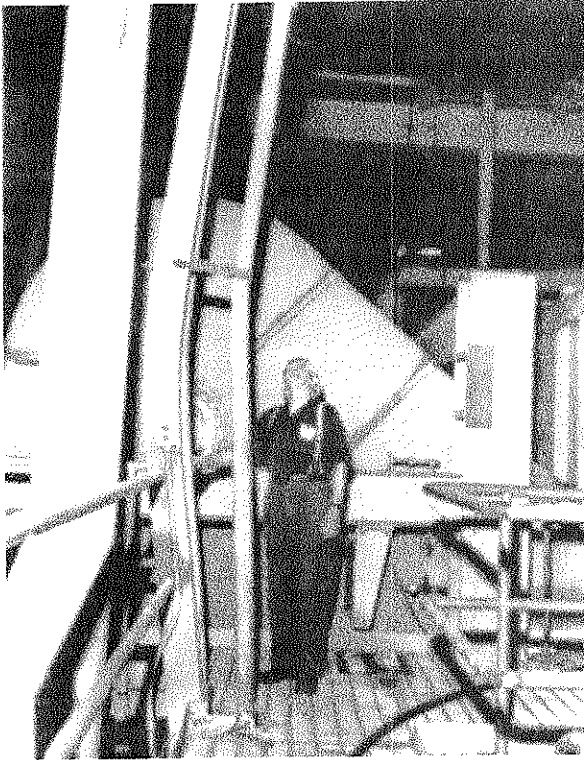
Bowed column in steel-frame structure. Buildings with similar kinds of damage should be posted Restricted Use or Unsafe, depending on the severity and extent of the damage.
